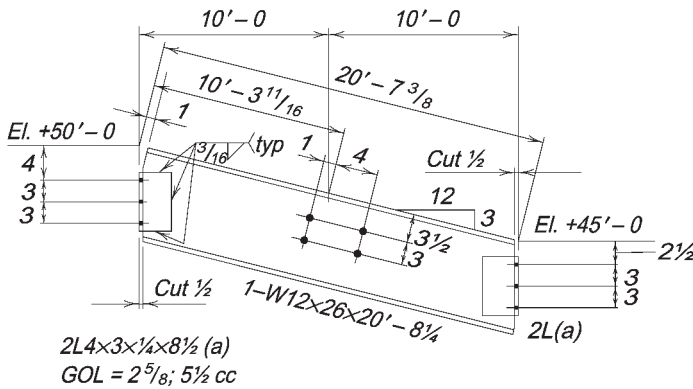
Sloped bolted/welded double-angle connection.
